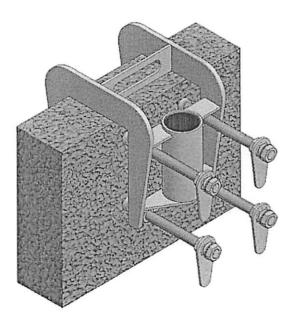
, Attaching Typical Barrel Mount Sleeve to Supporting Structure.
